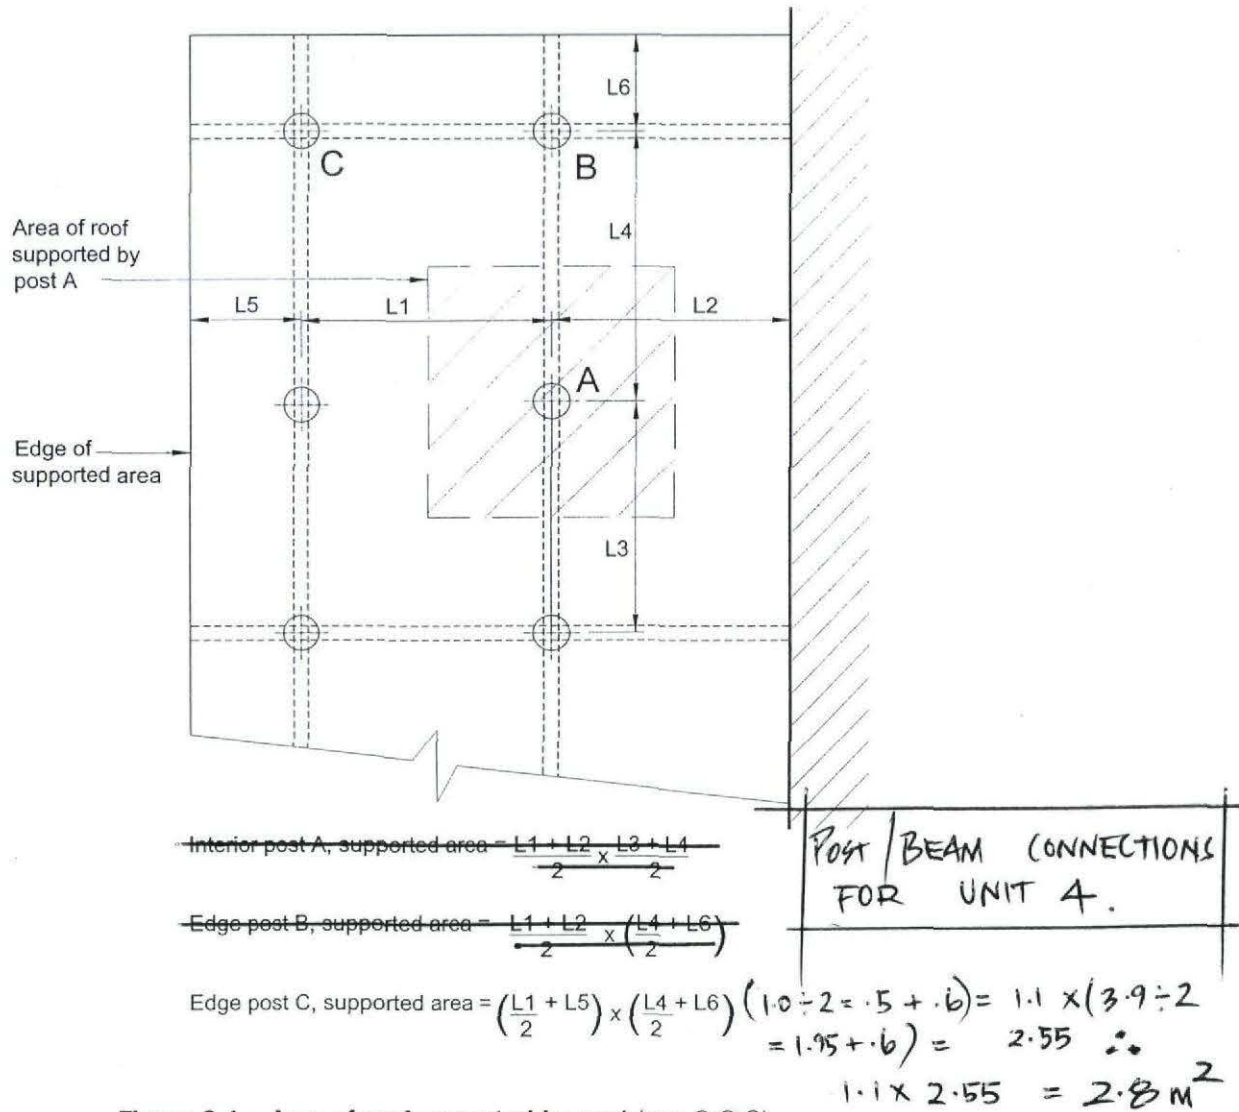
Area of roof supported by post (see 9.2.2)
